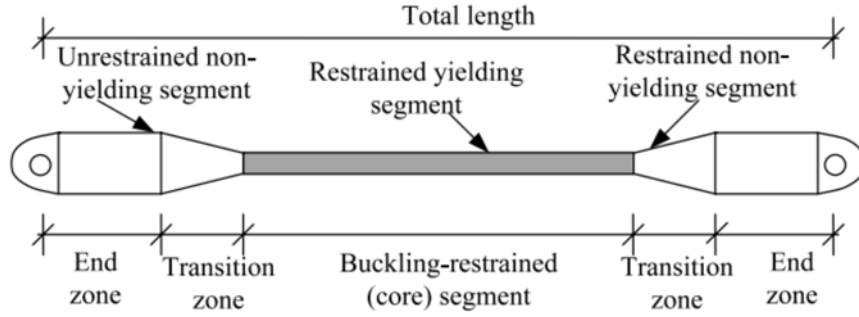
Typical section of a BRB (Sahoo and Chao, 2010)
